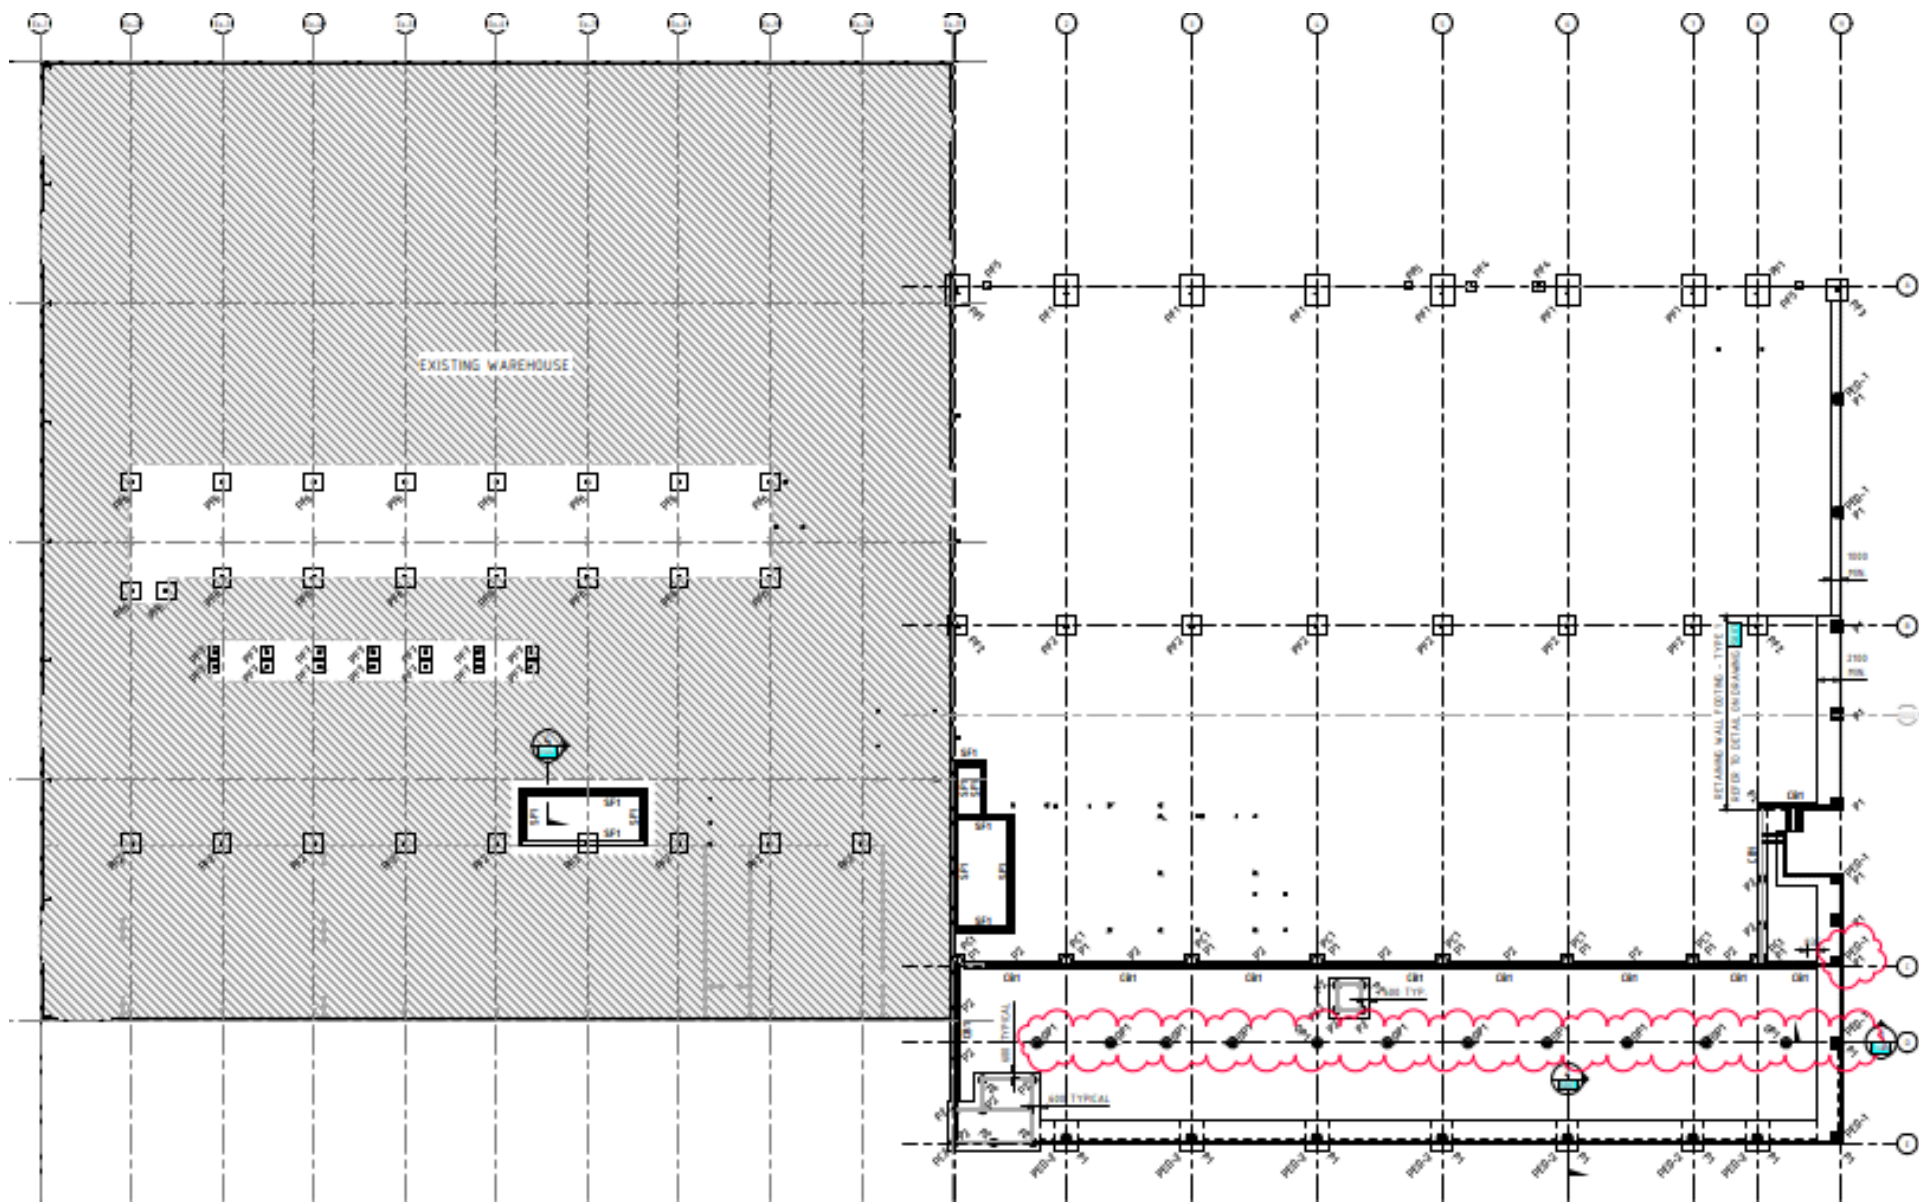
Warehouse Footing Plan, Indicating Extent of Piling Works Required
